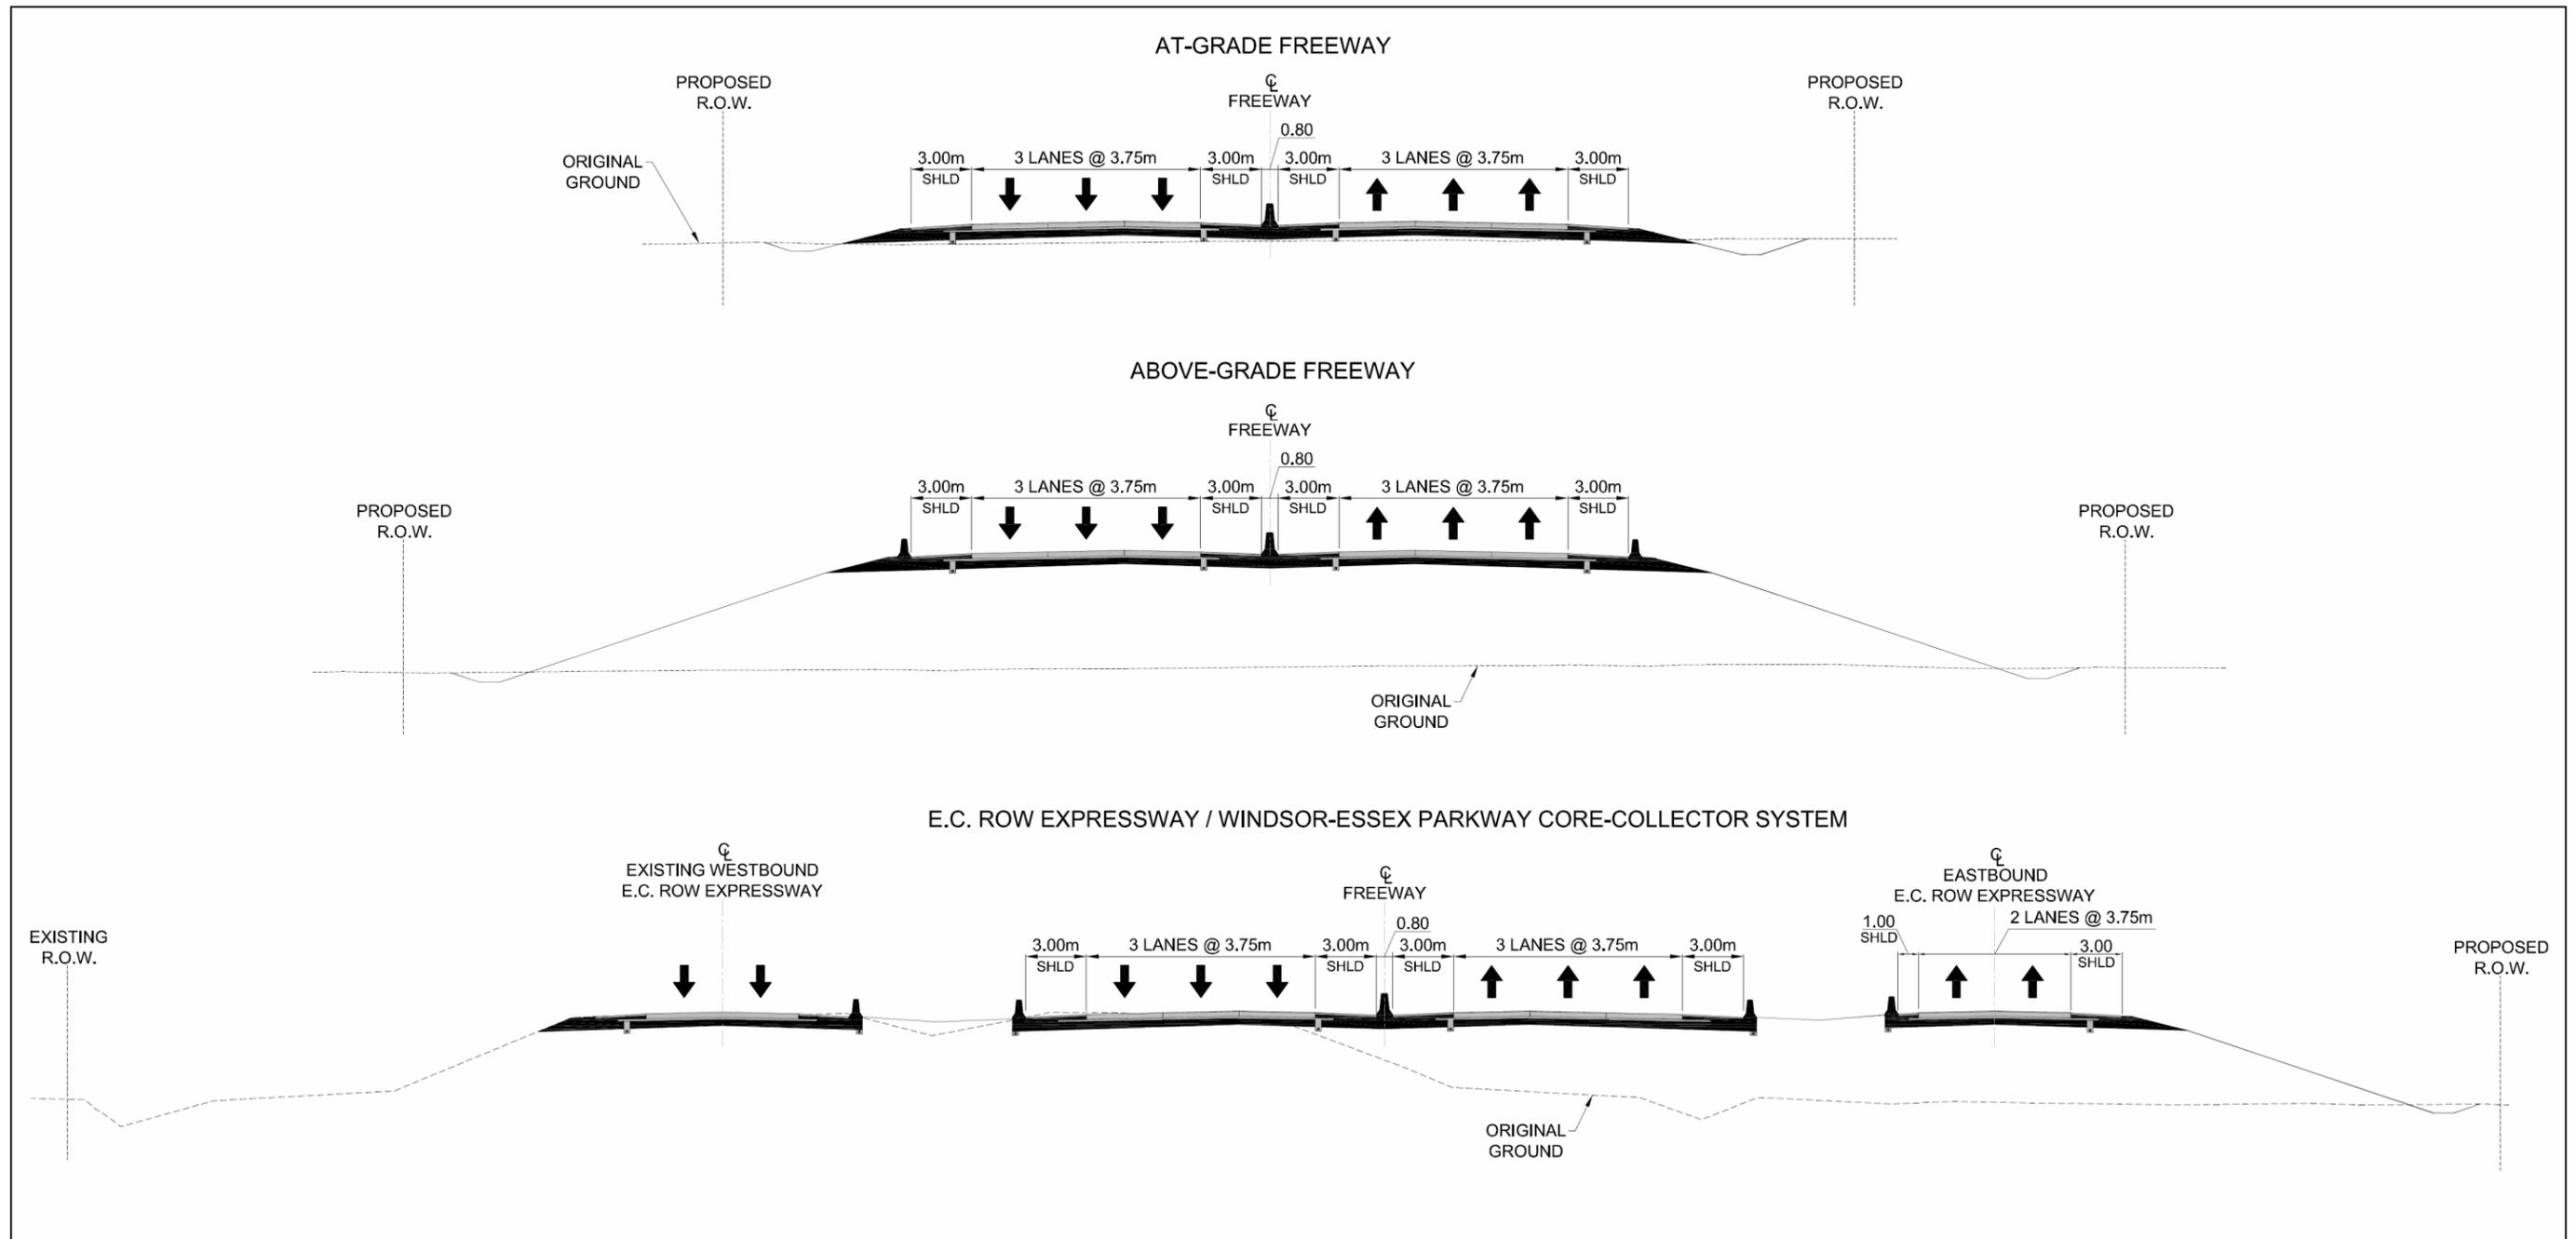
TYPICAL CROSS-SECTIONS – THE WINDSOR-ESSEX PARKWAY WITH NO SERVICE ROAD
